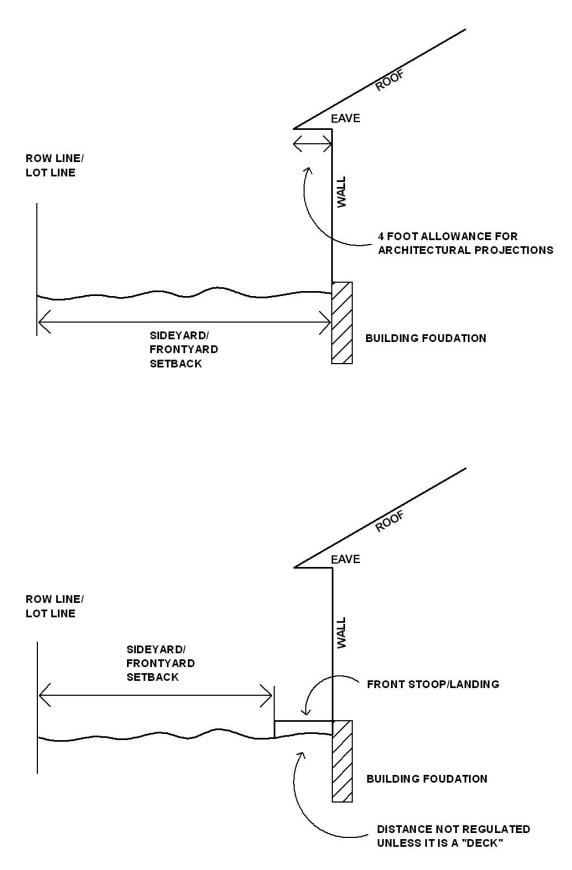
Building Setback Measurements Using Eave and Roof Overhangs
